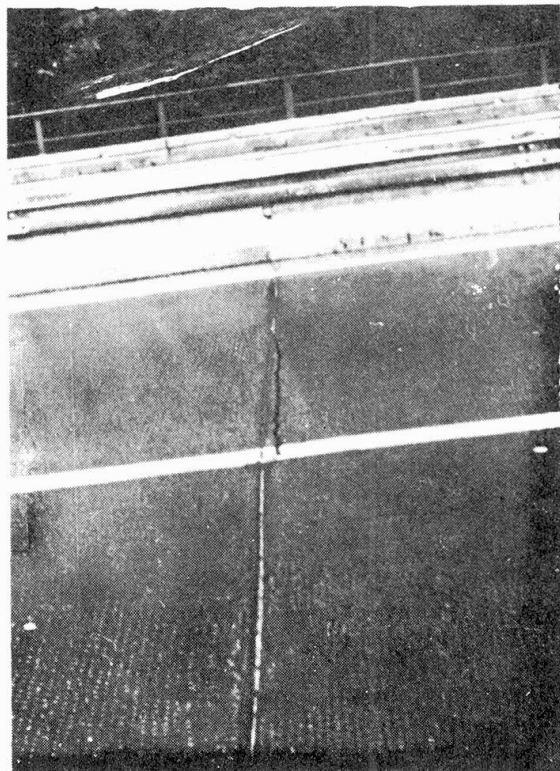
Transverse cracking behind steel anchor bar with joint on top
